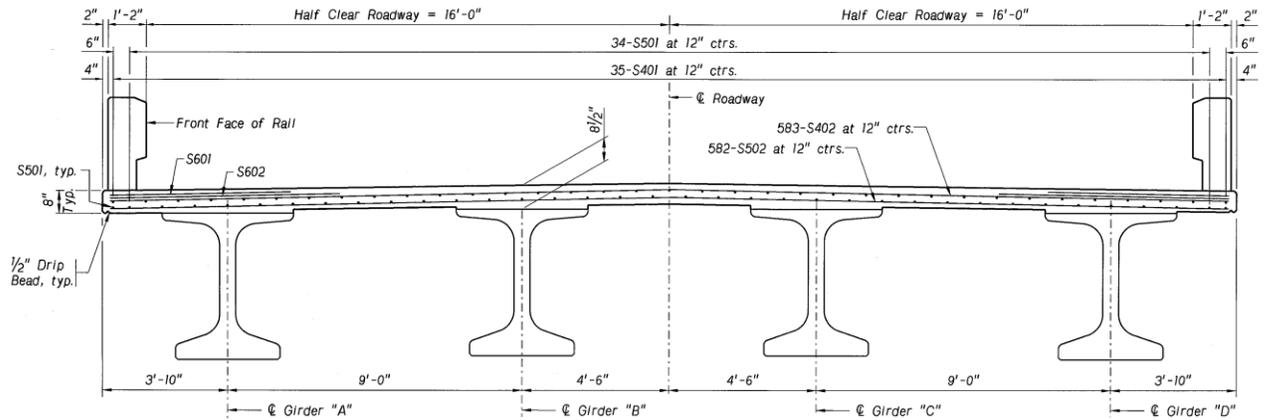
Cross section of the roadway of Oxford South Bridge, NE
